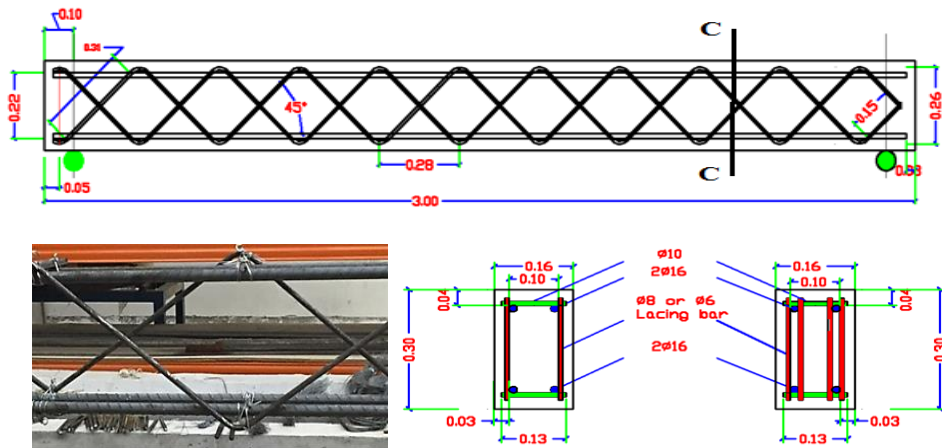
LRC Beams with angle 45° lacing inclination to horizontal.
